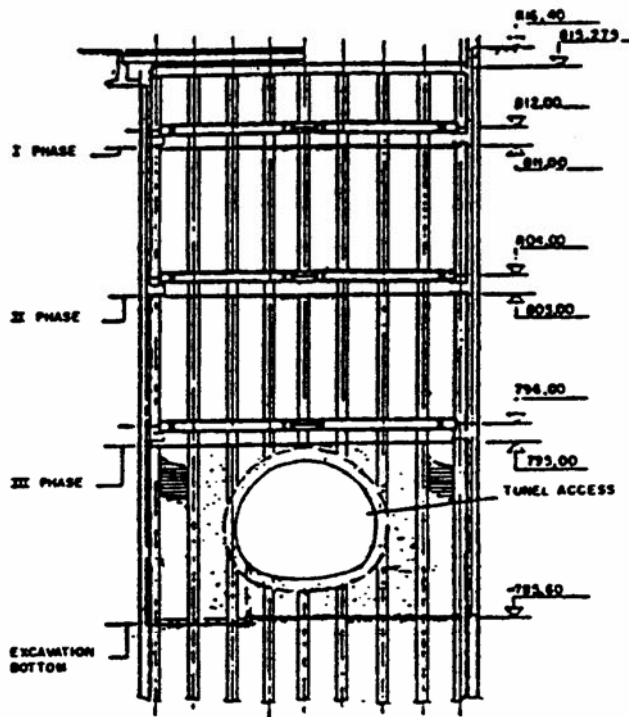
Cross-Section of the Poço Salas Técnicas Excavation
